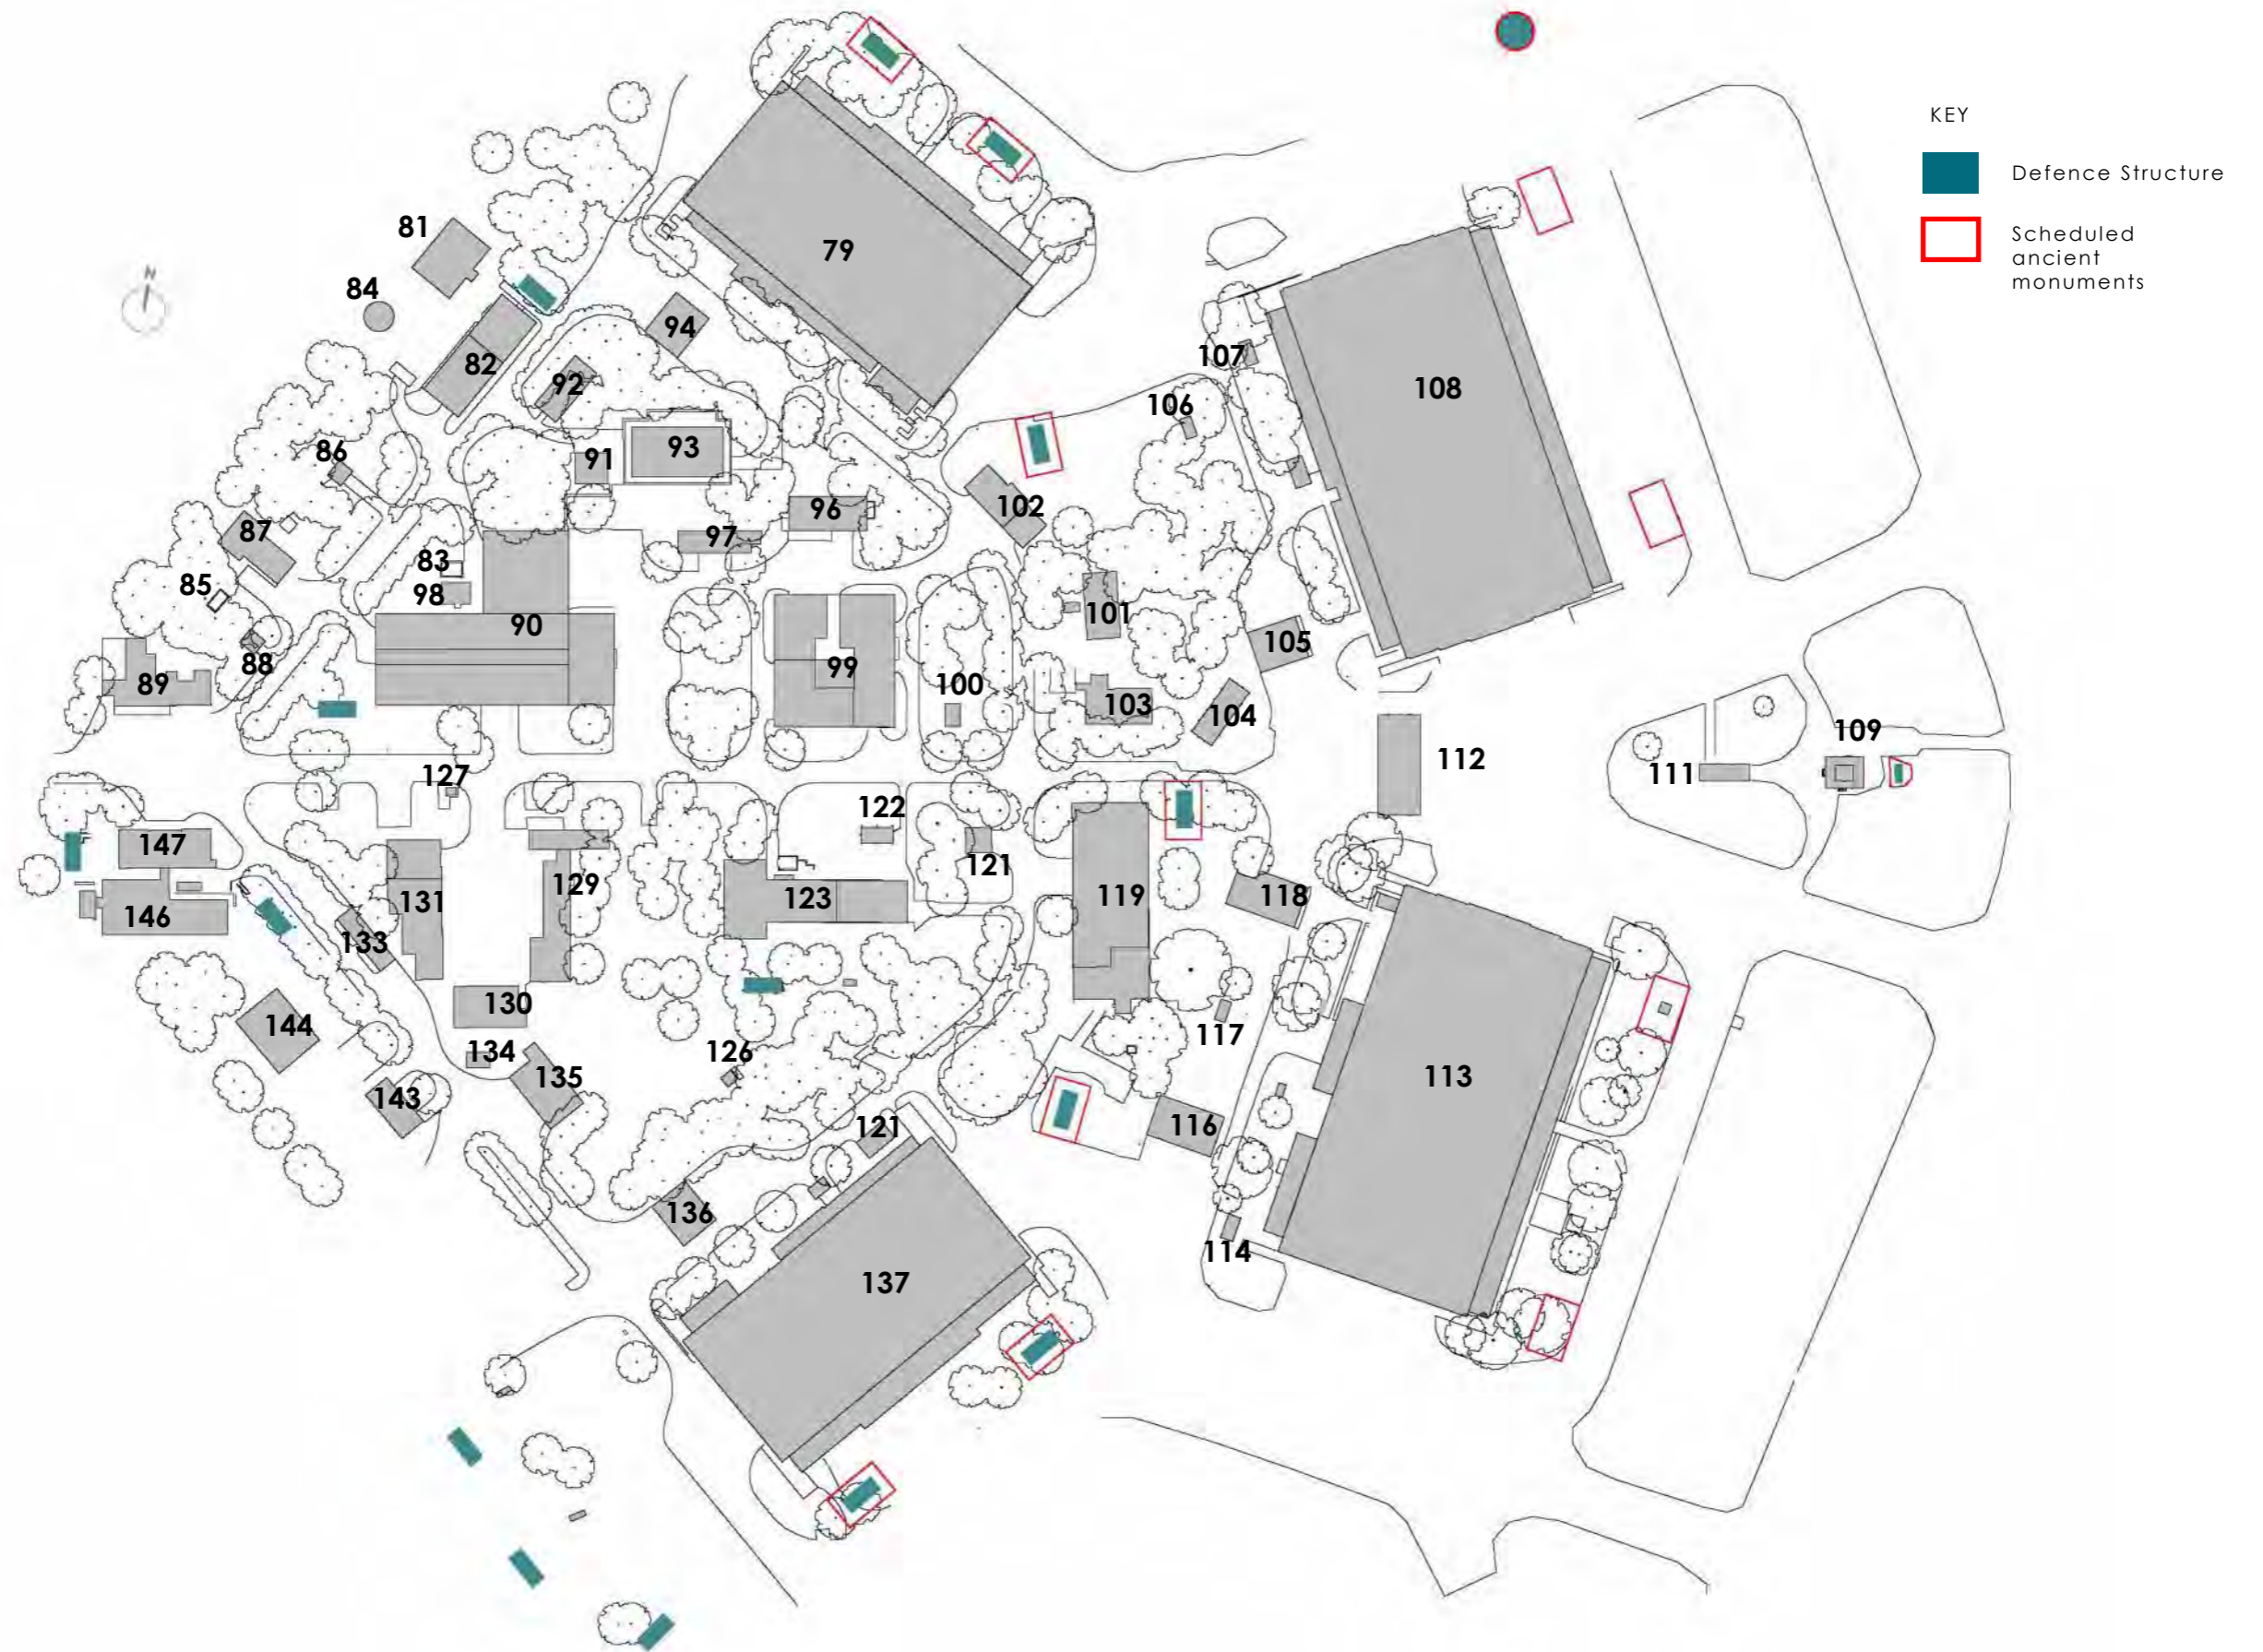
Site plan showing existing buildings, schedule ancient monuments and defence structures
